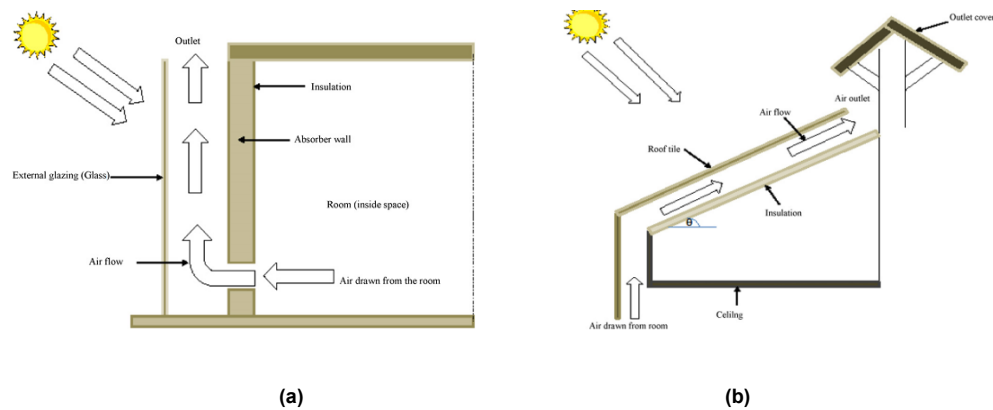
Solar chimney principle and main elements: (left) wall solar chimney and (right) inclined roof solar chimney (Khanal and Lei, 2011).
